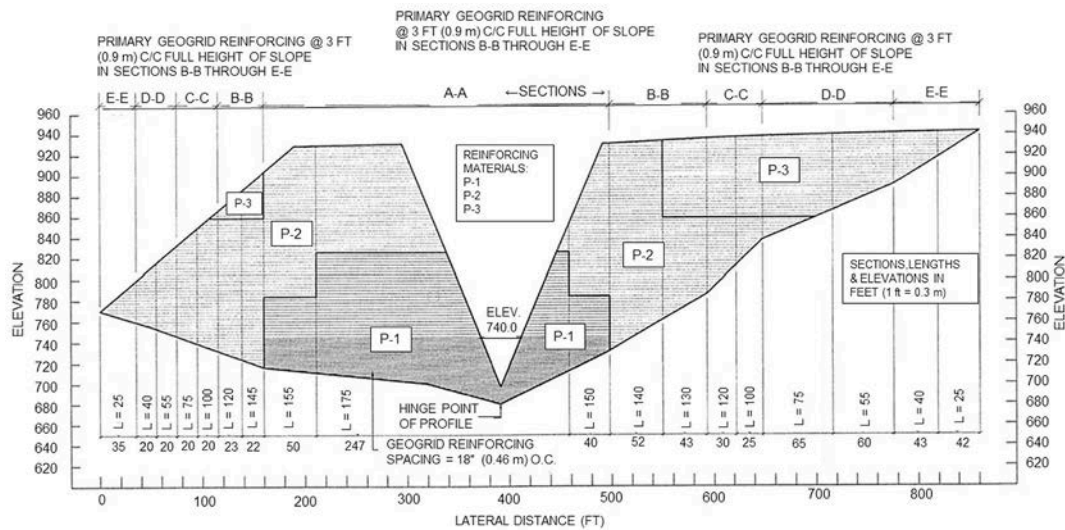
Construction plan front elevation view of RSS (after Triad Engineering, 2005).
